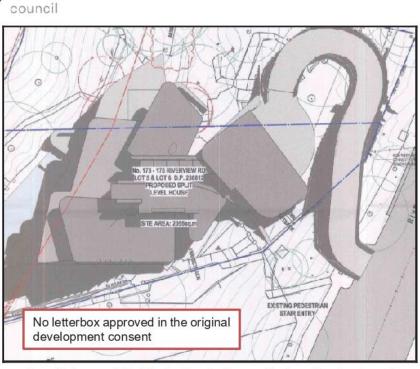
Approved Site Plan for the site (Source: Northern Beaches Council)
